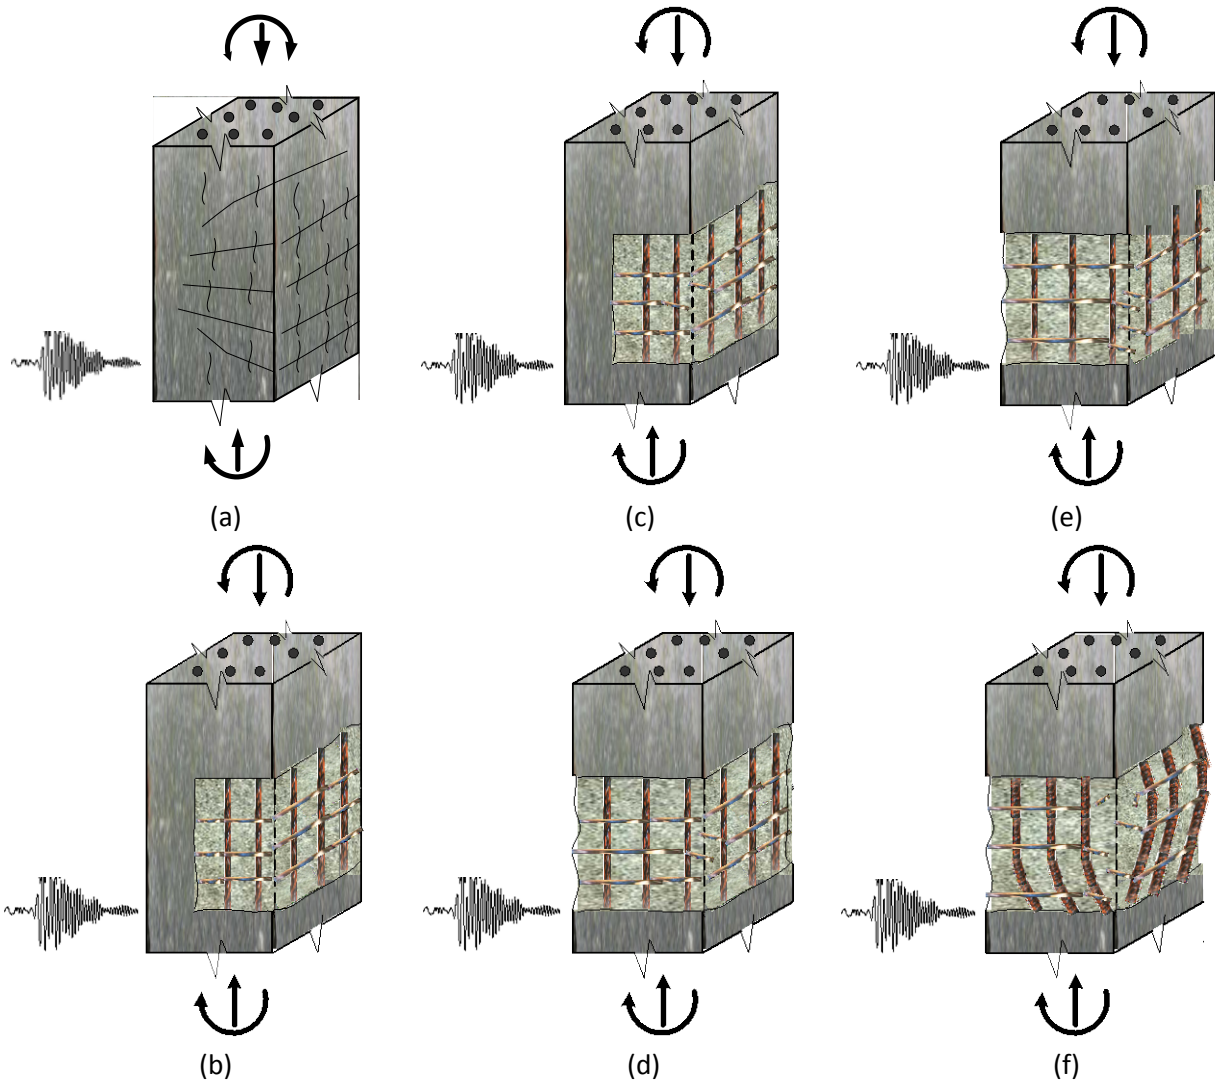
Possible damage and failure modes of RC columns due to combined gravity loads, seismic loads and reinforcement corrosion; (a) flexural and corrosion cracks; (b) initial spalling; (c) one stirrup failure; (d) spalling on all sides; (e) two stirrups failure; (f) loss of confinement and possible buckling.
